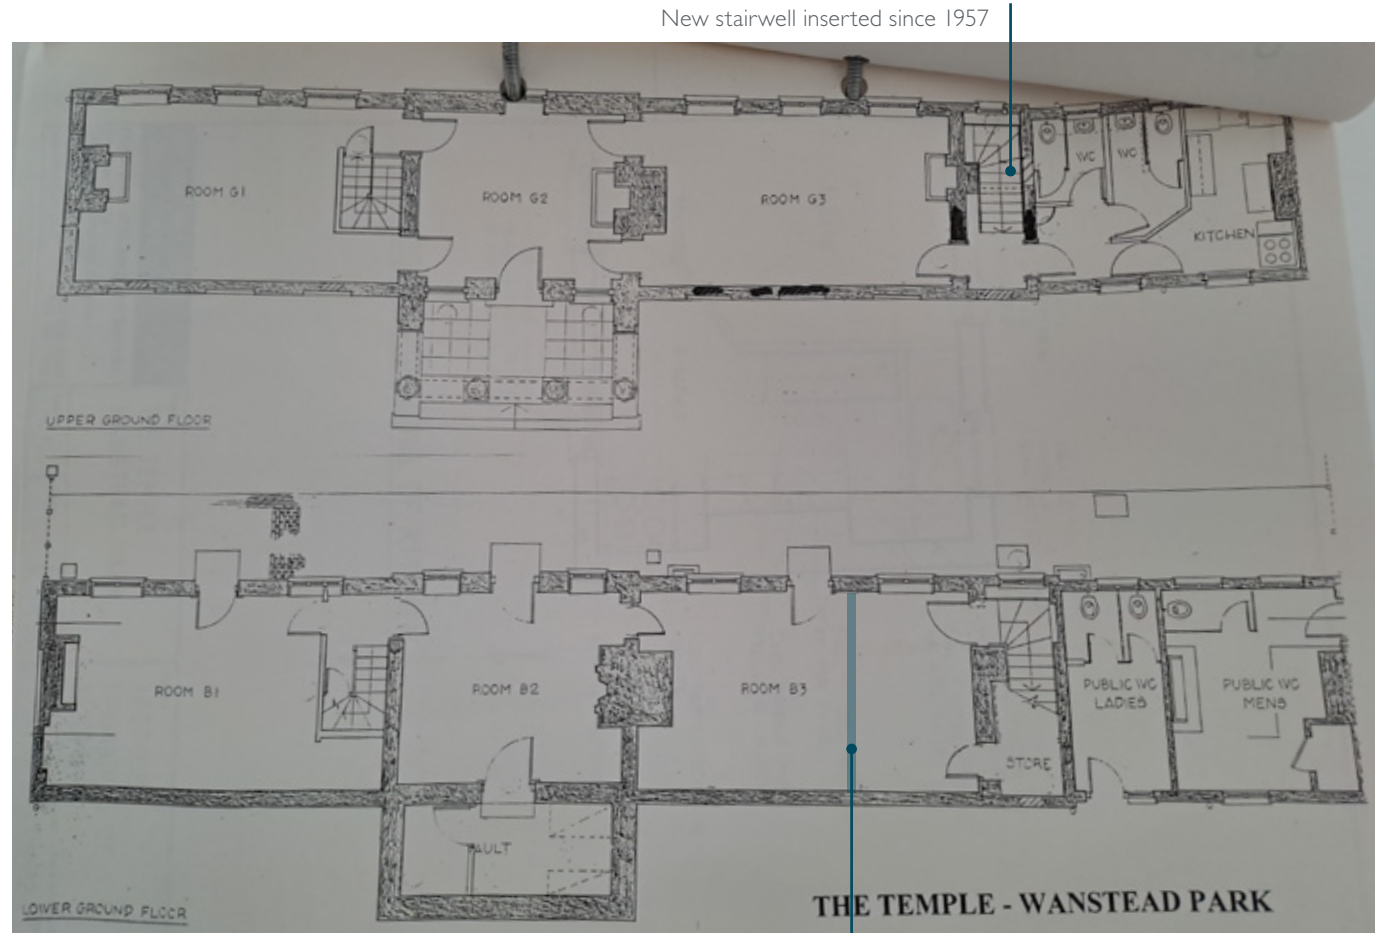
Floor plans from 1994. City of London Corporation, CTU/ITEM15 File 1
